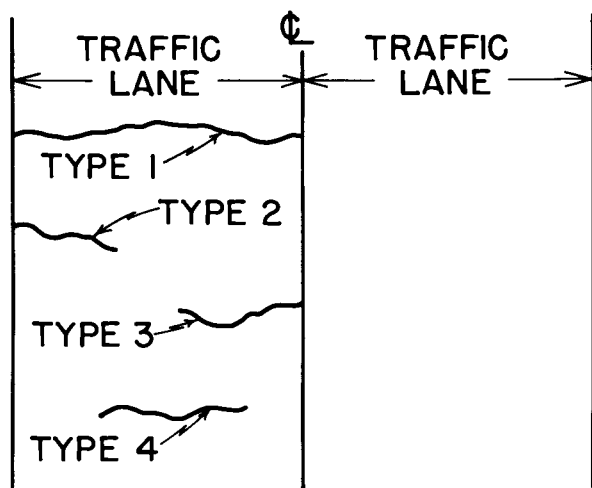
Types of Transverse Pavement Cracks.
